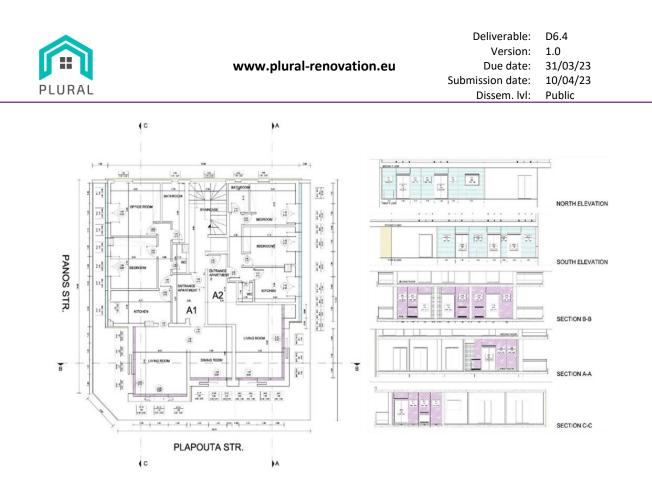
LAYOUT OF SMARTWALL INSTALLATION IN VVV DEMO BUILDING
